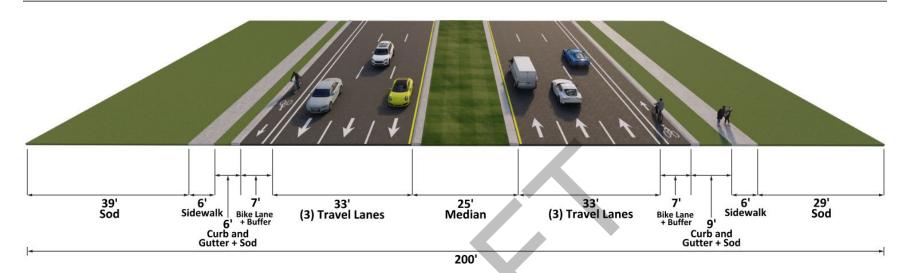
Alternative B – US 41 from Foley Road to Springs Plaza/Access Road
